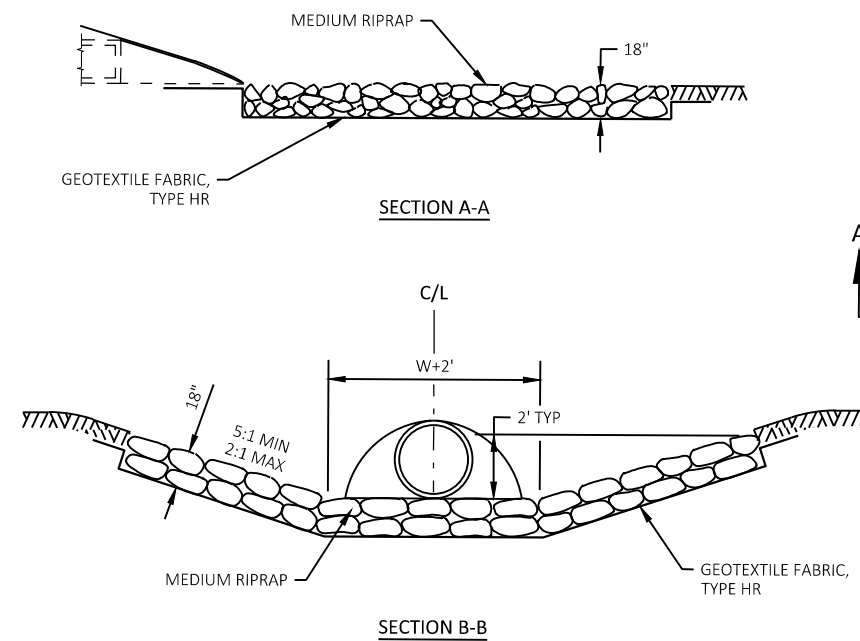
DETAIL FOR RIPRAP MEDIUM IN DITCHES
